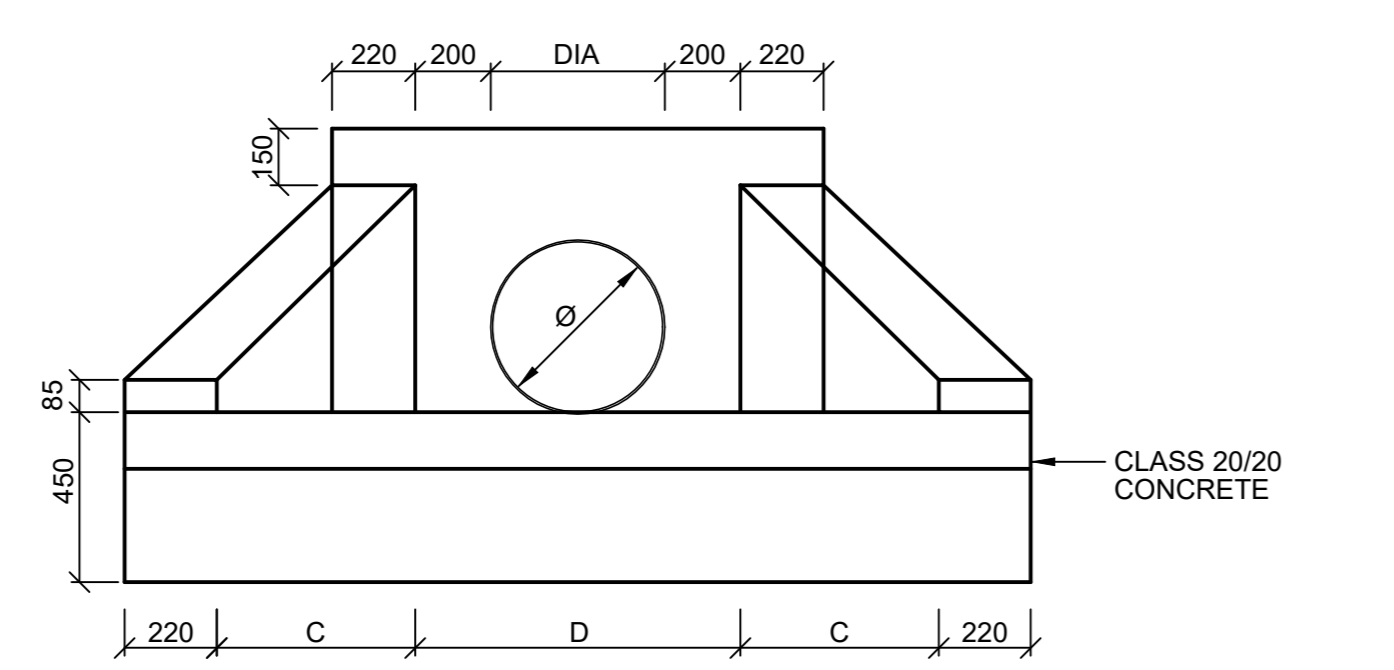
DETAIL OF SUPPORTS OF CONCRETE PANELS
